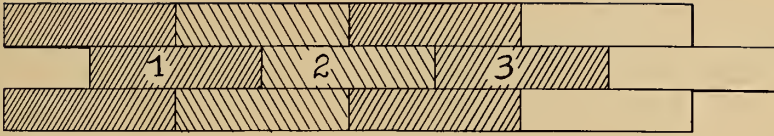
WAKEFIELD WOODEN SHEET PILING
